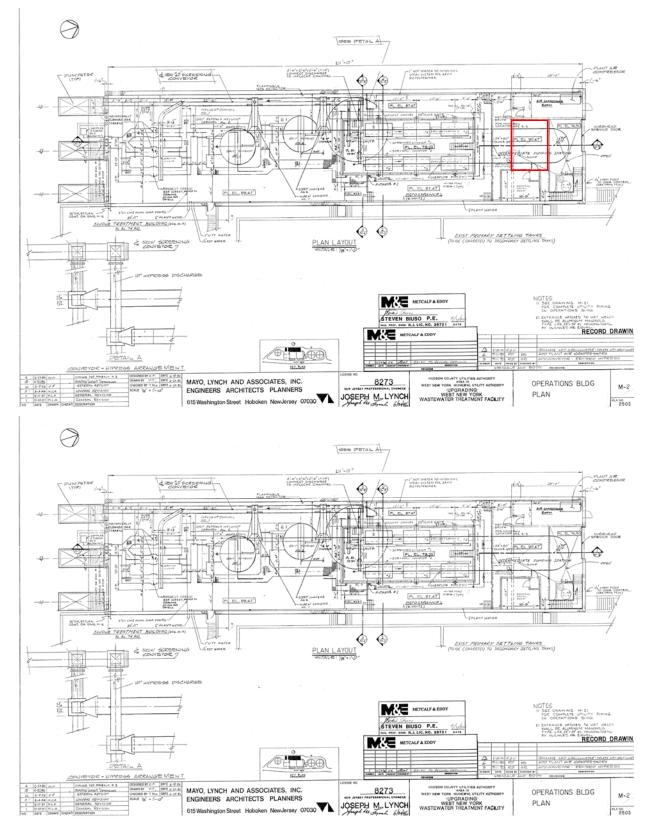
Plant Plan Drawing showing open area in preliminary treatment building
